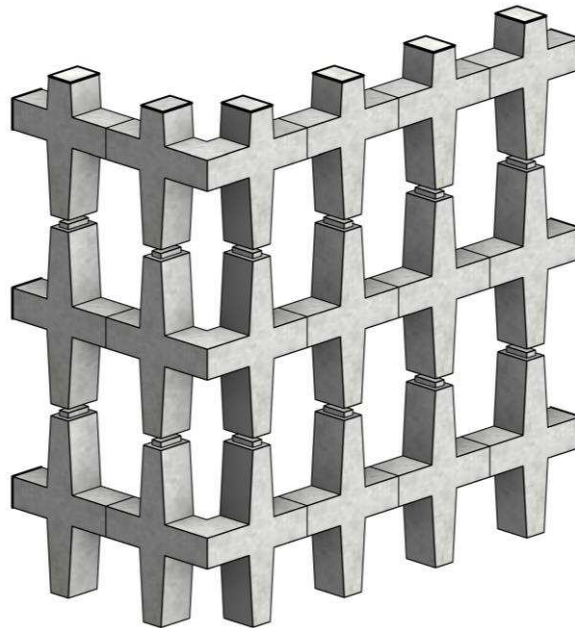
Precast structural cross; installation of joints are at sections where bending is minimal during high seismic demand
